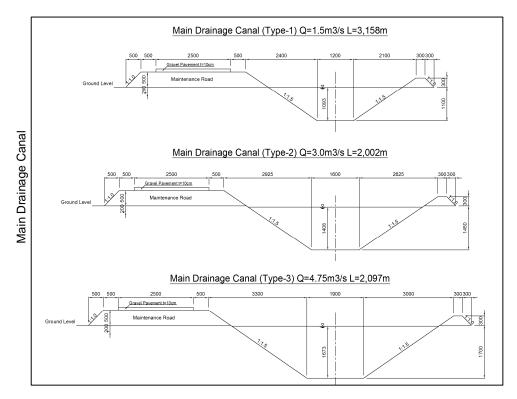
Typical Cross Section of Main Drainage Canal
